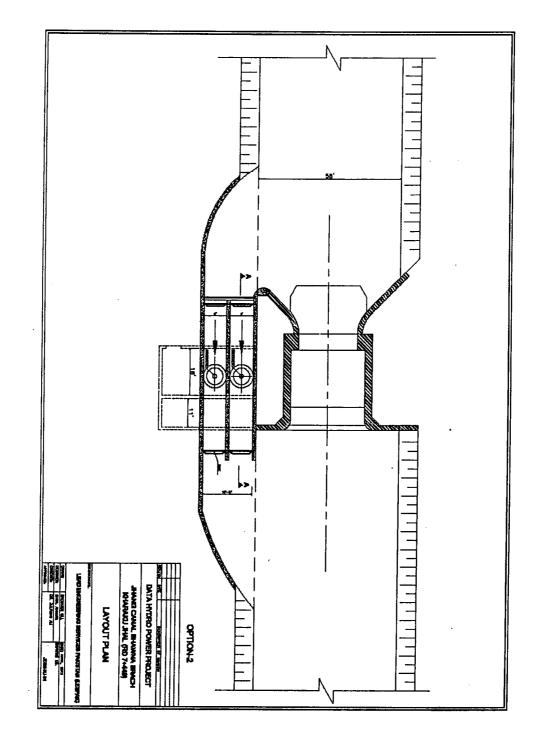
Fall at RD 7+449 (Option-2, Layout Plan)
